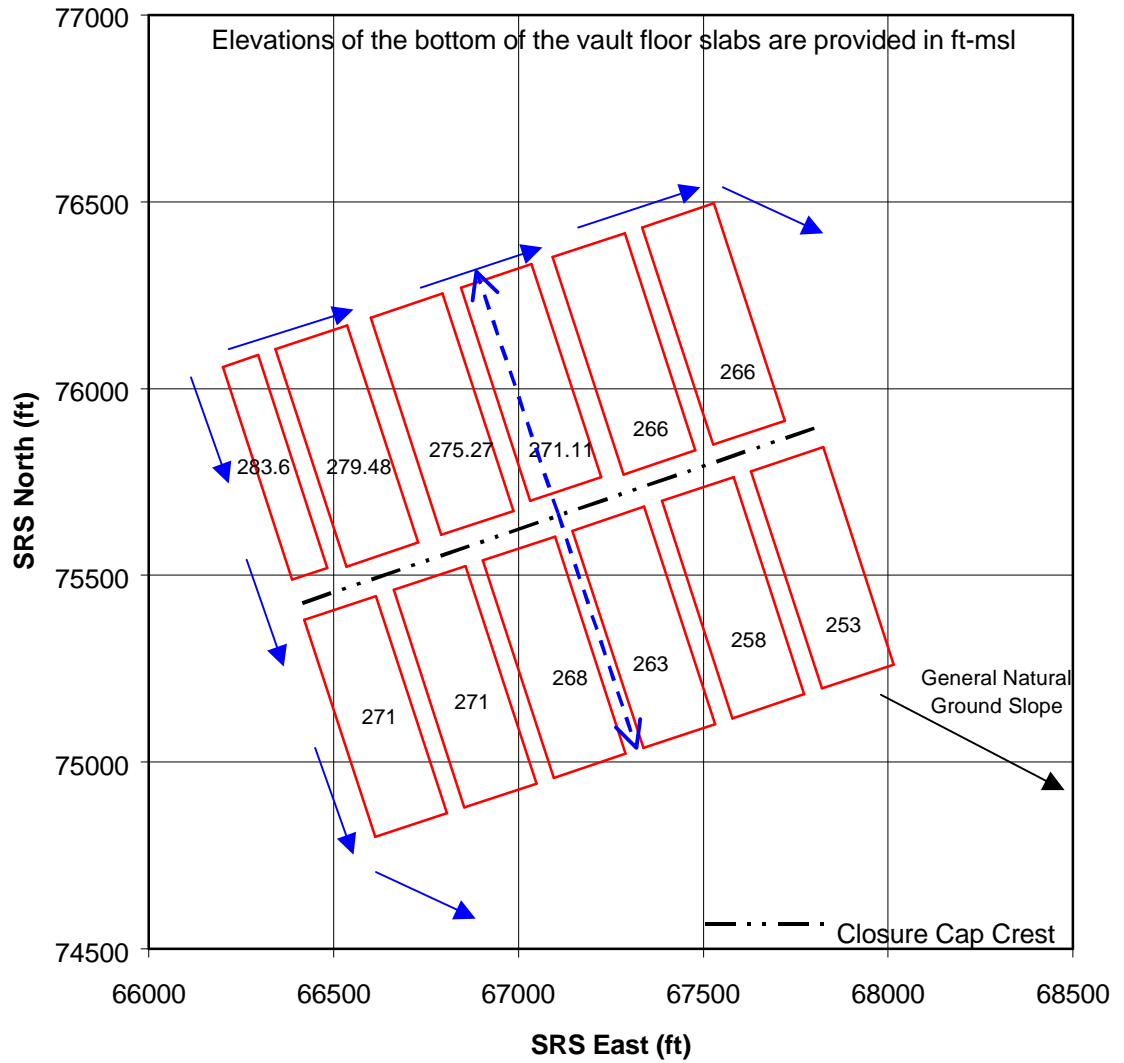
Current PA and Closure Plan 600-foot Slope Length Drainage System Configuration
